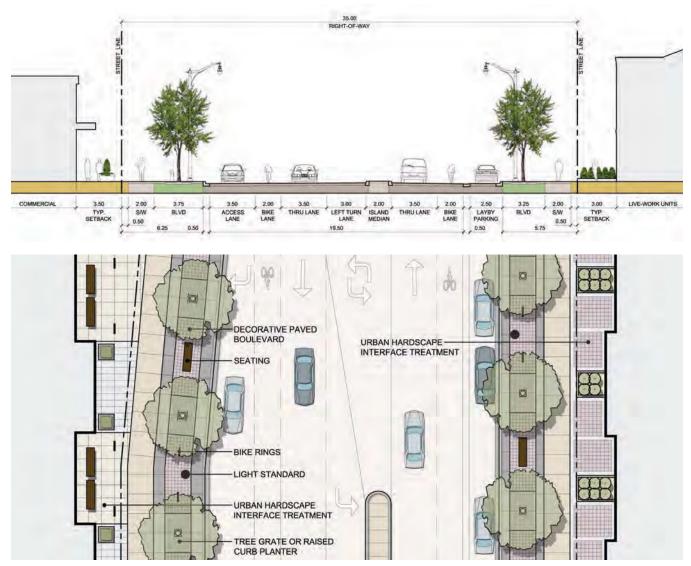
Section B1-B1: Conceptual Spine Road treatment west of McLaughlin Road (35.0m ROW) with 2 thru lanes, left turn lane, layby parking on one side, on-street bike lanes, and street trees in grates adjacent to commercial and live-work units (looking west).
